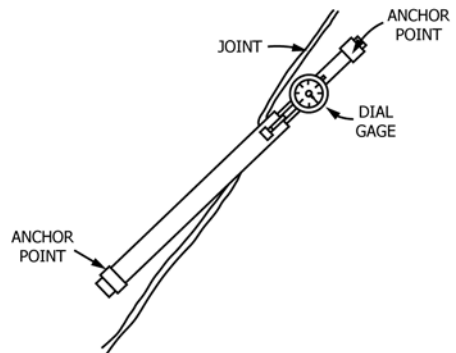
Extensometer Set Up as Joint or Crack Meter to Measure Dilation or Shear
